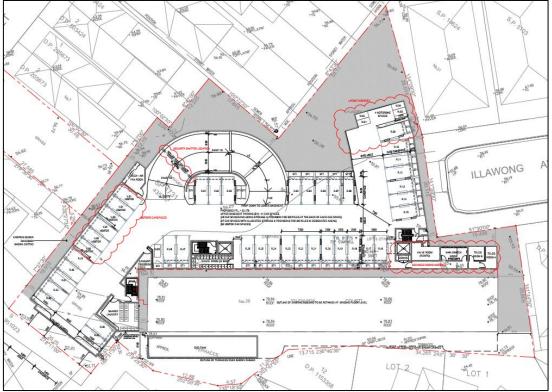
Extract of Proposed Upper Basement Carpark (B1) Plan – 20 Illawong Avenue, Tamarama Source: Group GSA
